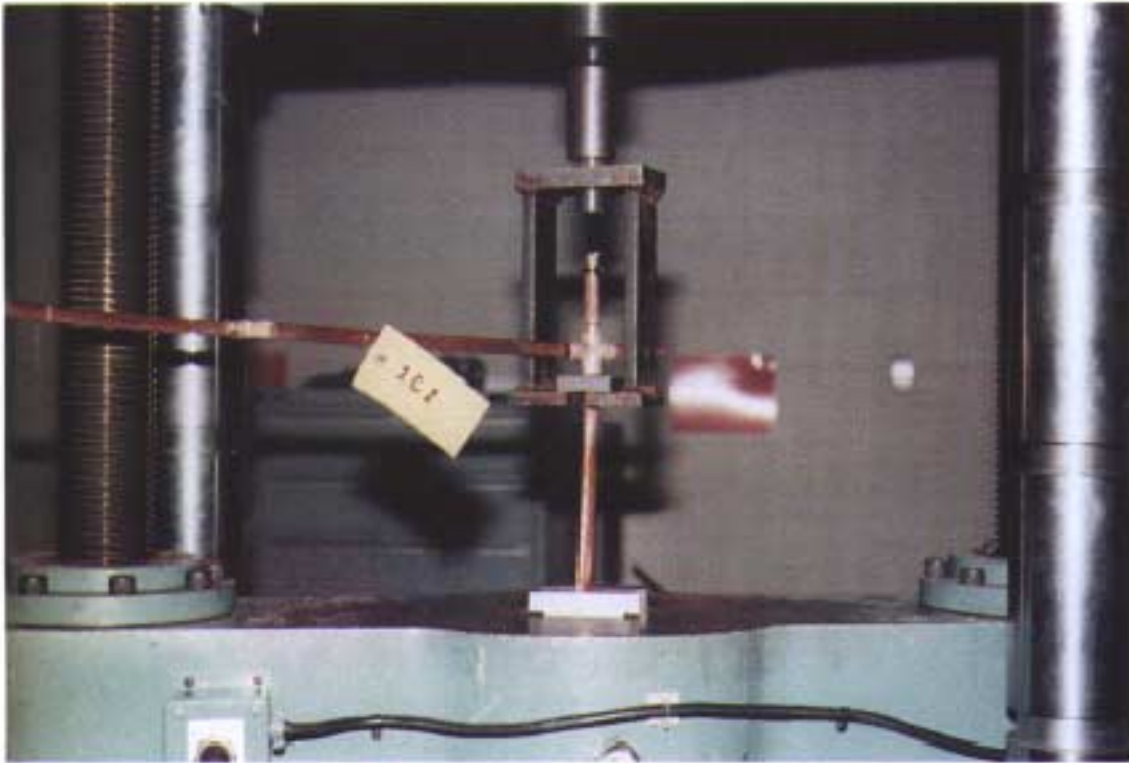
Typical Mounting of Connector for Mechanical Pullout Test
